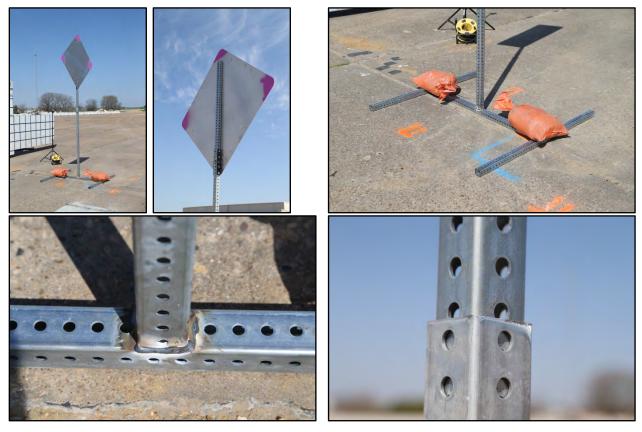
Option B Temporary Work Zone Sign Support Used for Test No. 490026-2-2.
